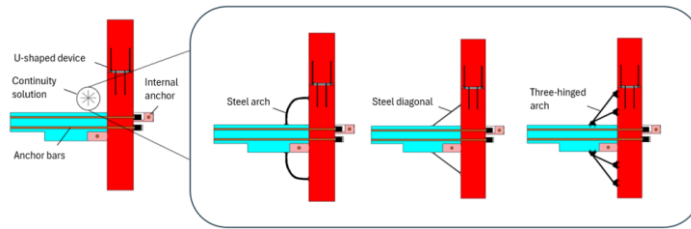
Non-monolithic column-to-beam connections using: (i) steel arch; (ii) steel diagonal; (iii) three-hinged arch. Connections can be integrated with post-tensioning tendons or anchor bars passing through the beams.
